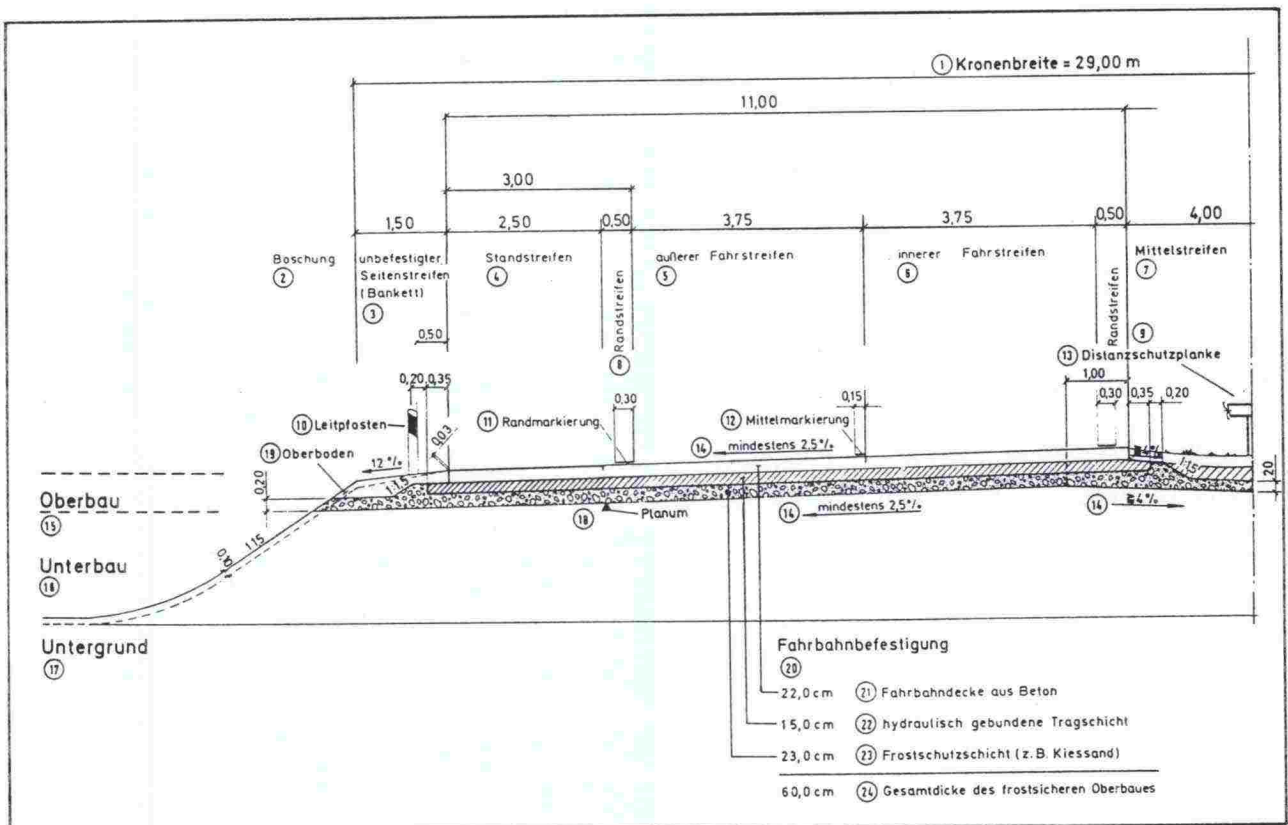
A typical cross-section of a concrete road in Germany /4/
